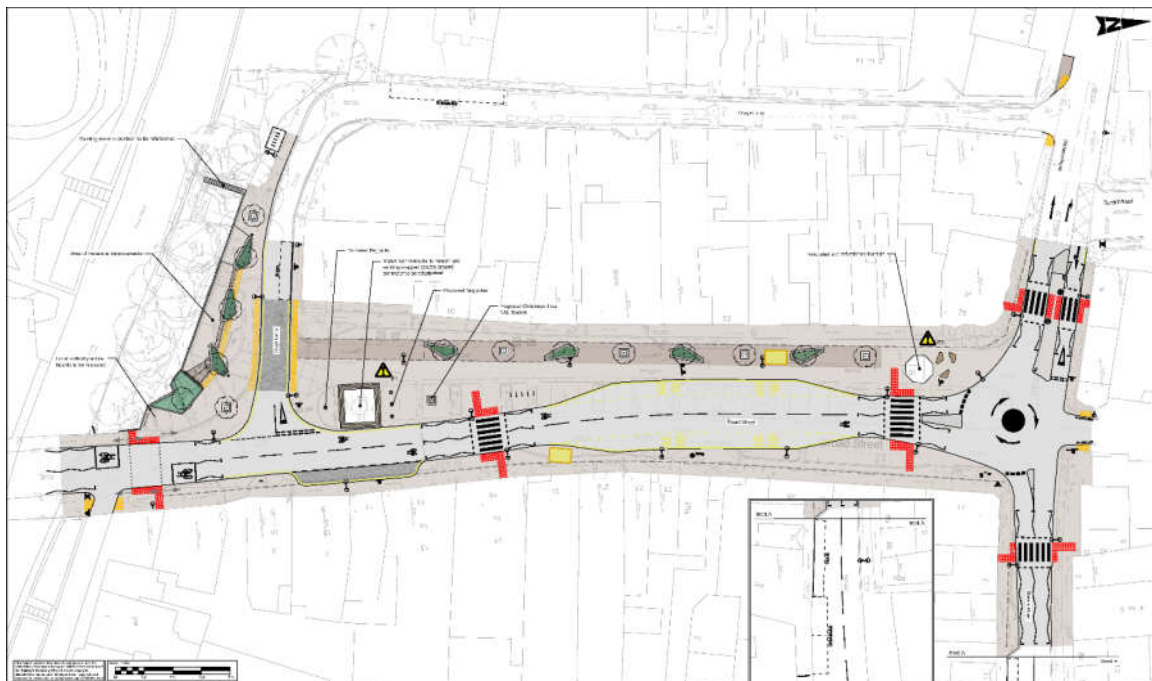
Broad Street General Arrangement Snapshot (Version C06)
